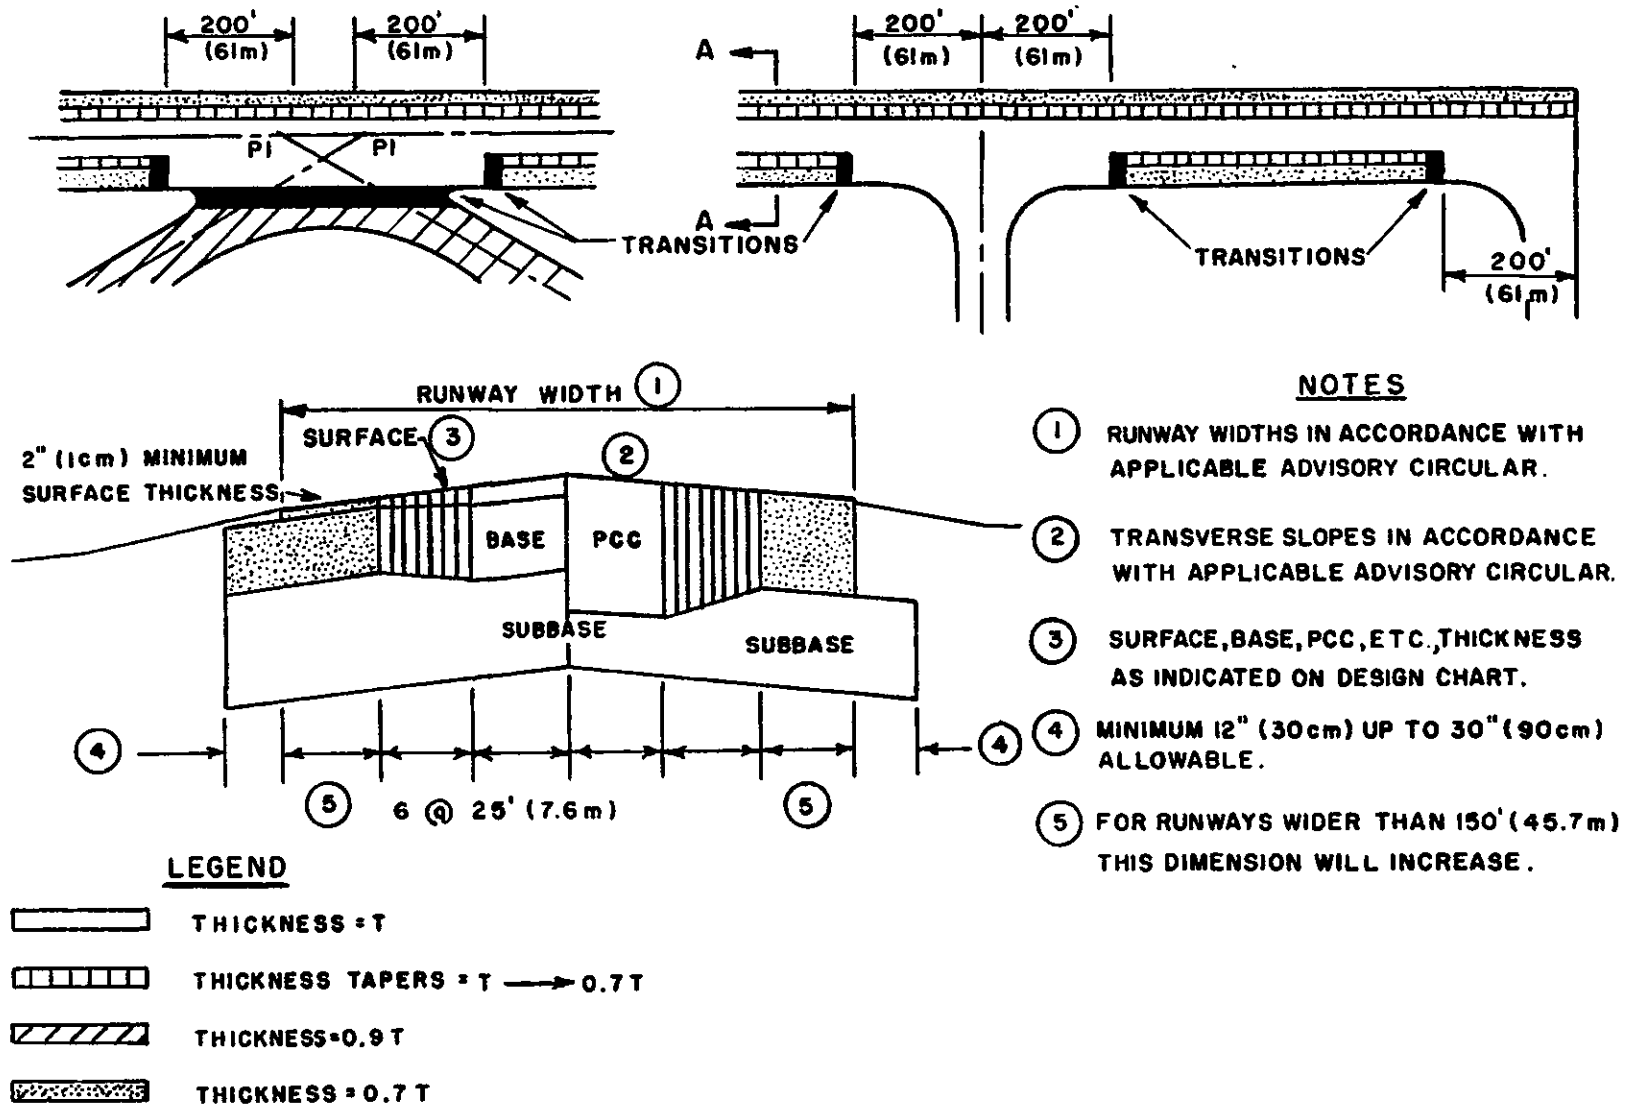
TYPICAL PLAN AND CROSS SECTION FOR RUNWAY PAVEMENTS
